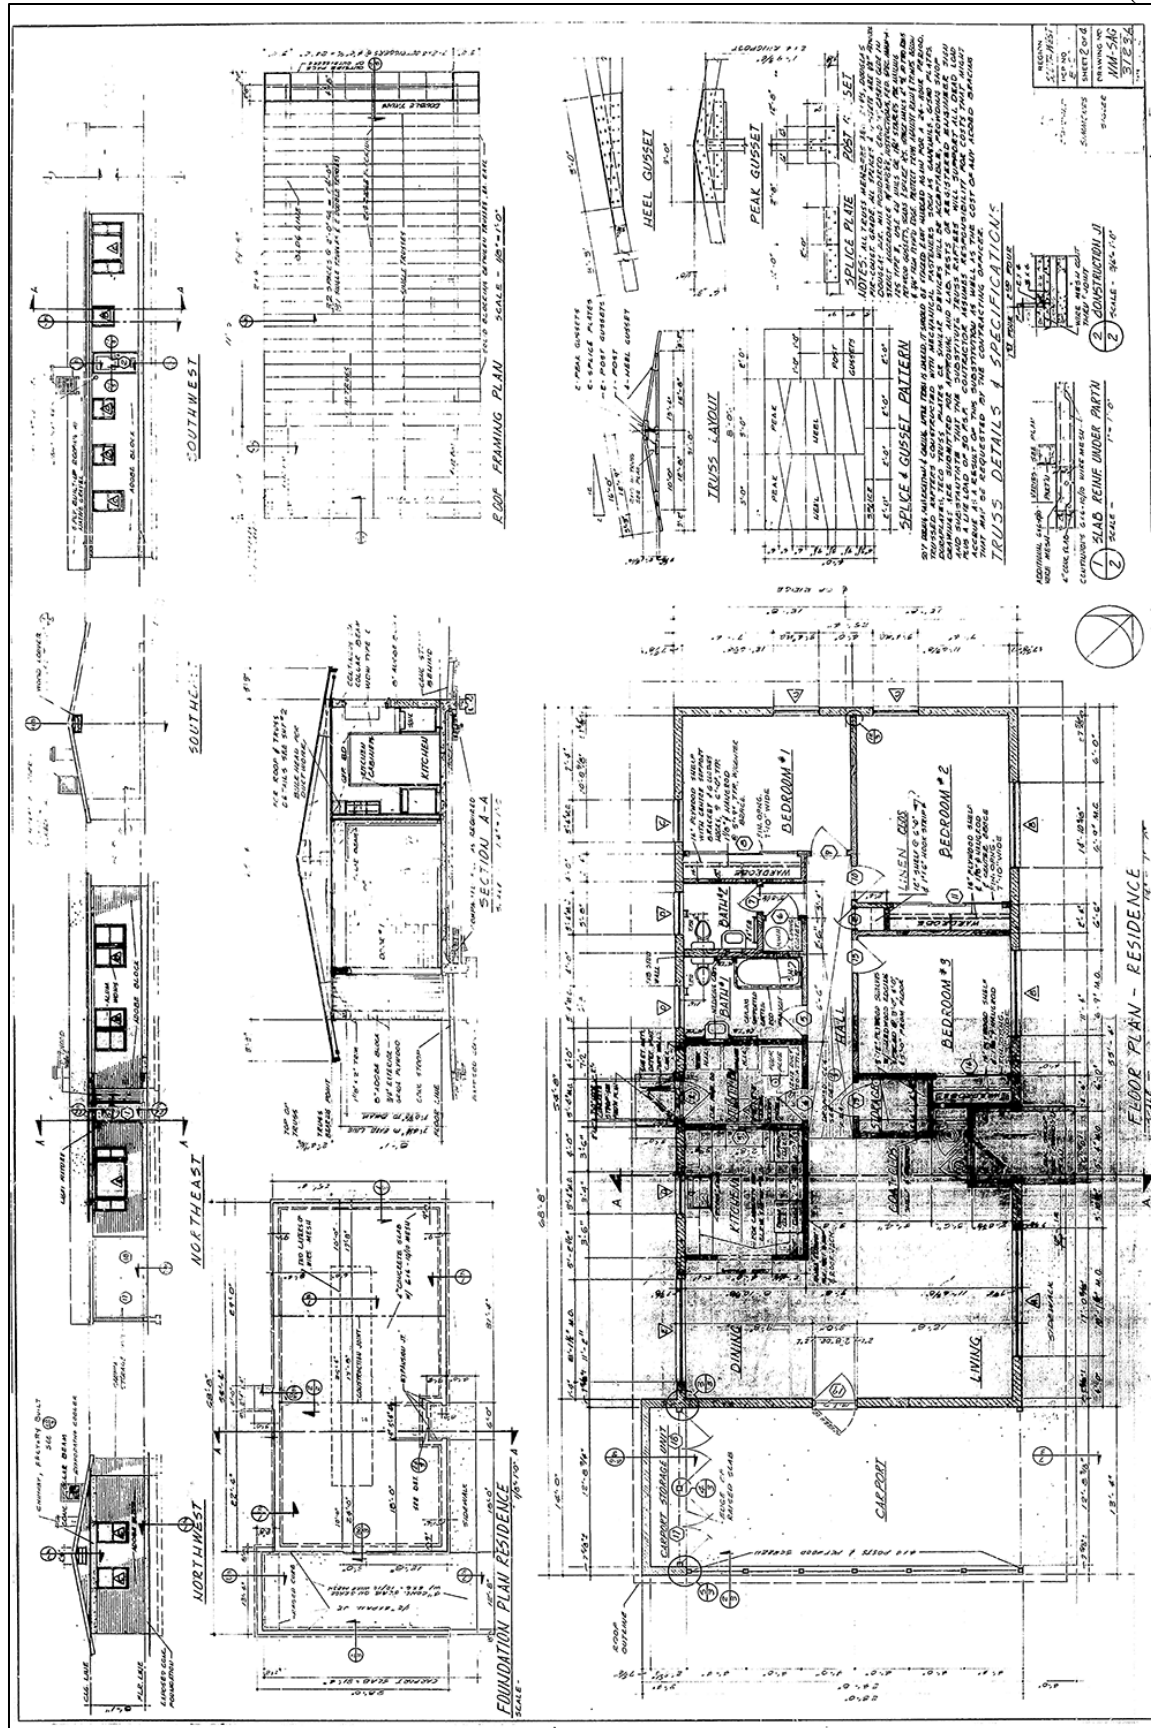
Drawing NM-SAG 3123-A, Sheet 2 of 4. Residence Building Plan, Buildings 14, 15, and 16. Dated not readable.
